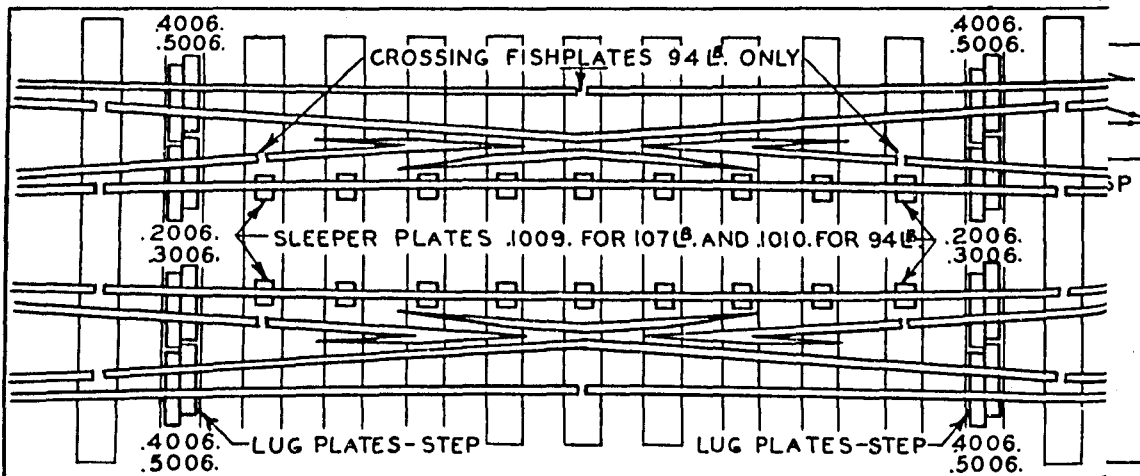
No. 7-52. 94 & 107 LB. COMPOUND. DETAIL AT K CROSSINGS
